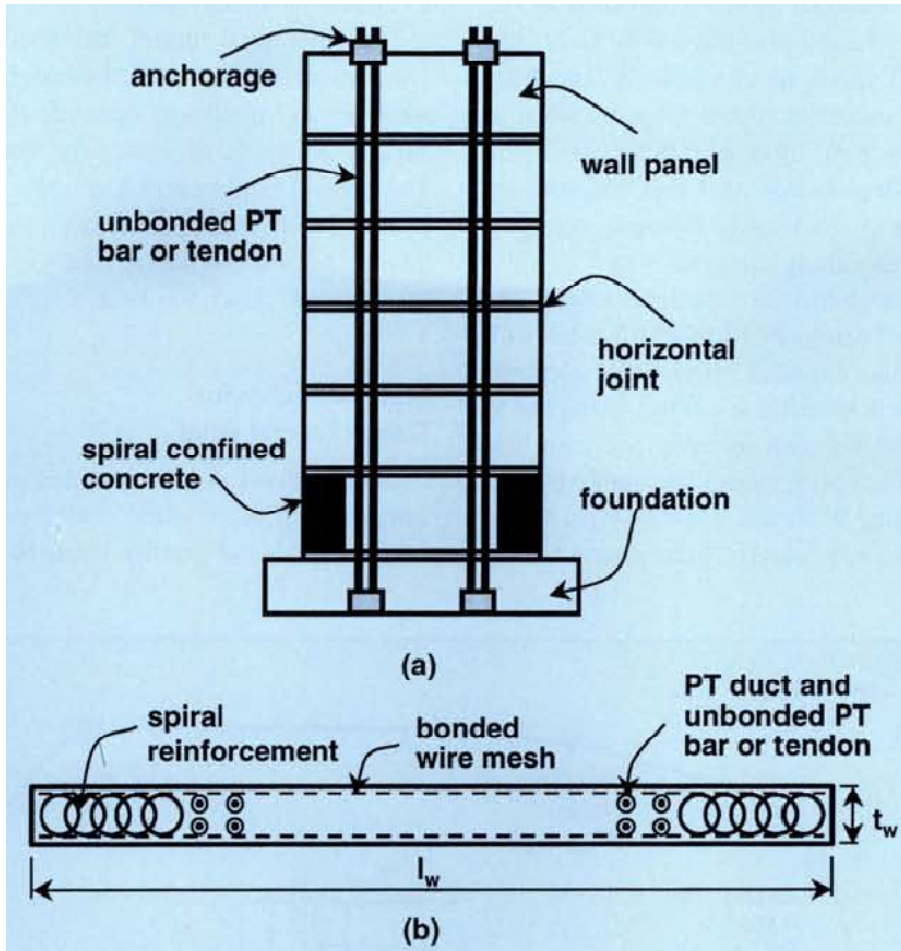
Unbonded post-tensioned precast wall: (a) elevation; (b) enlarged cross section near base (Kurama et al. 1999a)
